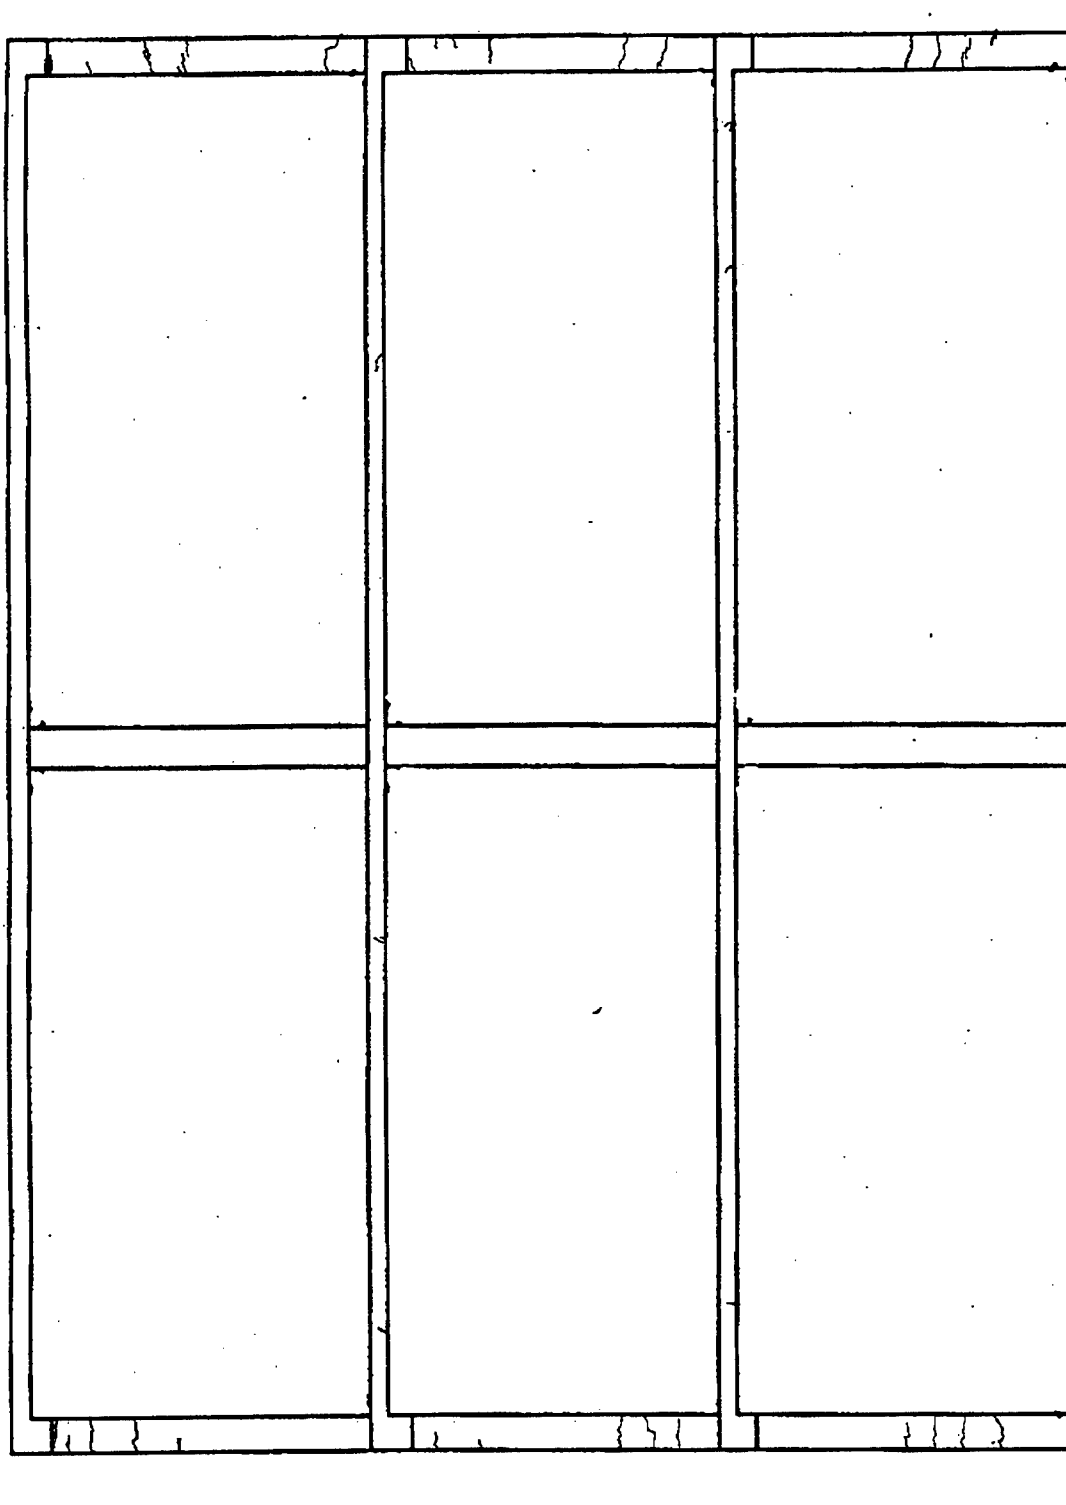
Crack Pattern, East Side of East Columns, Pre-Test
